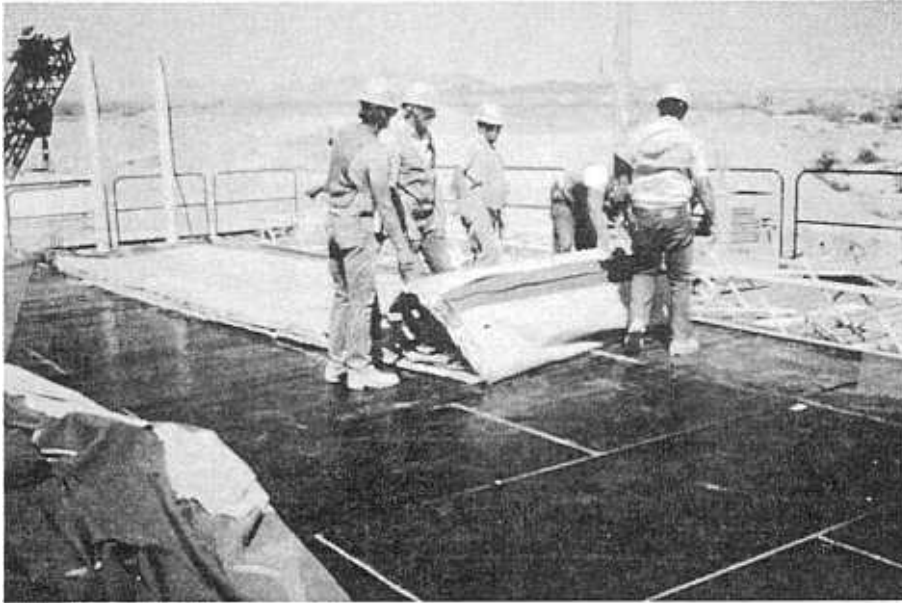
Unfolding PVC/geotextile composite lining on paver deck prior to making transverse field seam.
